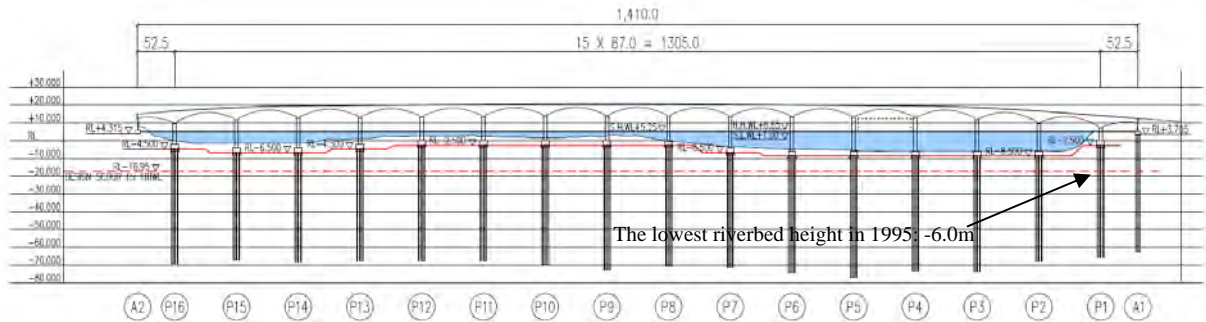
Longitudinal Profile of Existing Gumti Bridge (1995)
